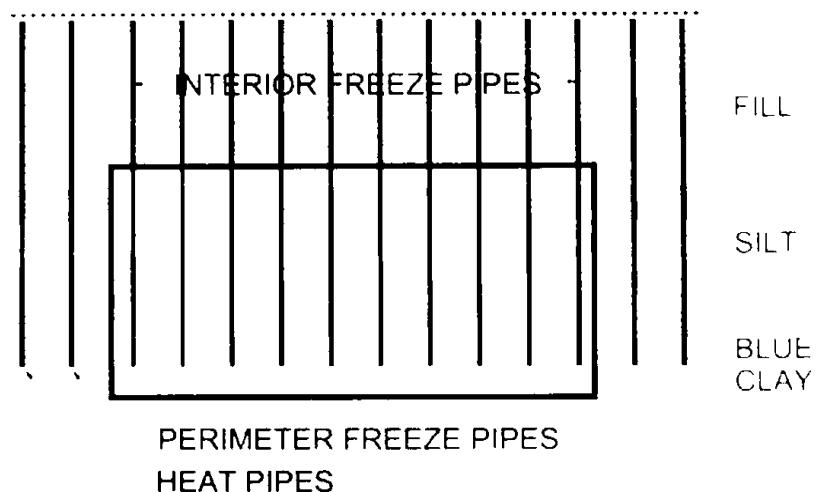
Schematic Arrangement of Freeze Pipes to Freeze Ground Mass Prior to Tunnel Jacking
